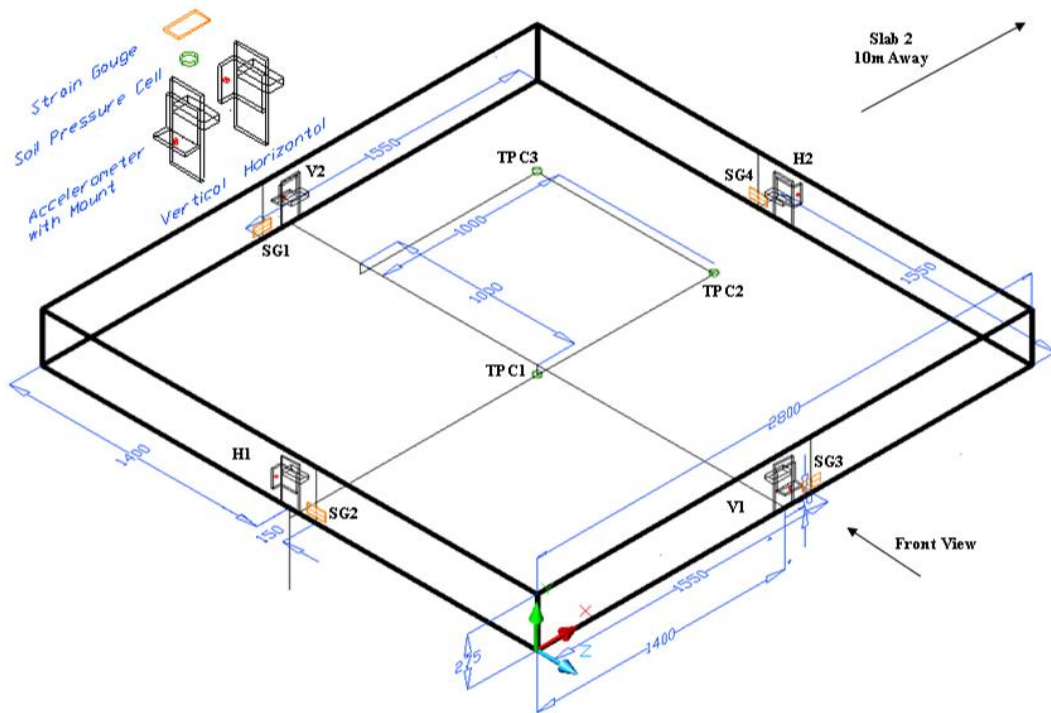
Instrumentation layout for Slab 1 (3D View)
